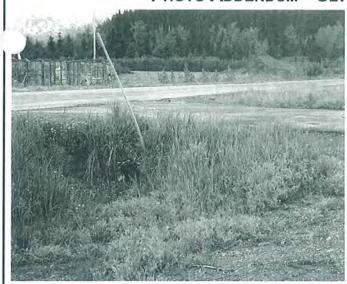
CULVERT OUTFALL, LOCATION OF SAMLING
